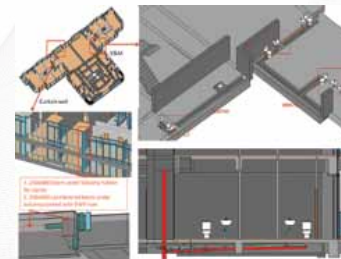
Design coordination of plumbing & drainage system within column slab and outside window wall types of foundation work.
